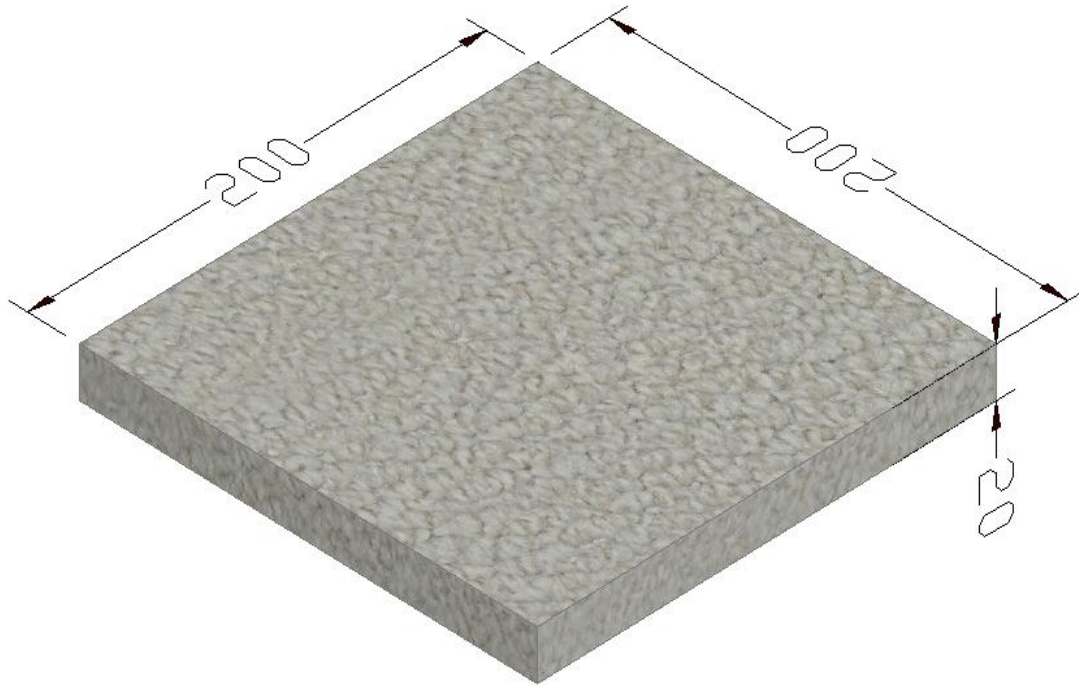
3D drawing of waste glass floor tile (20*20*2cm)
